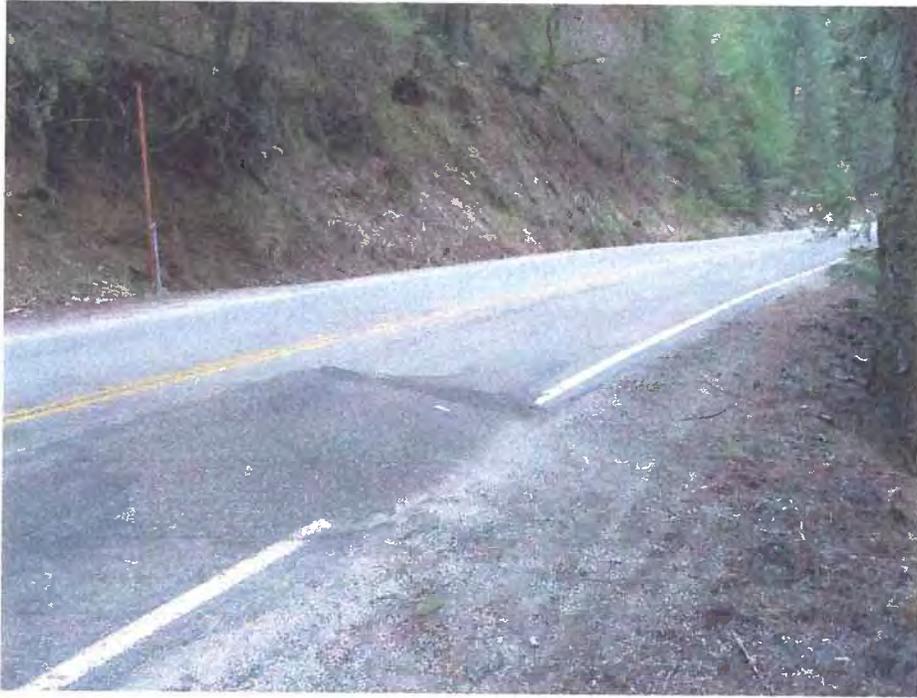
MP 3.79 - Failure at culvert on west side of road.
